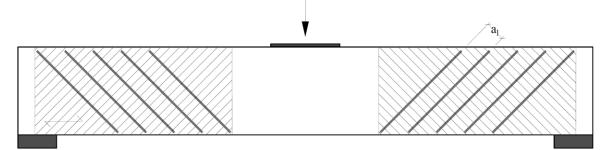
Timber member with shear reinforcement; shaded areas: reinforced areas
